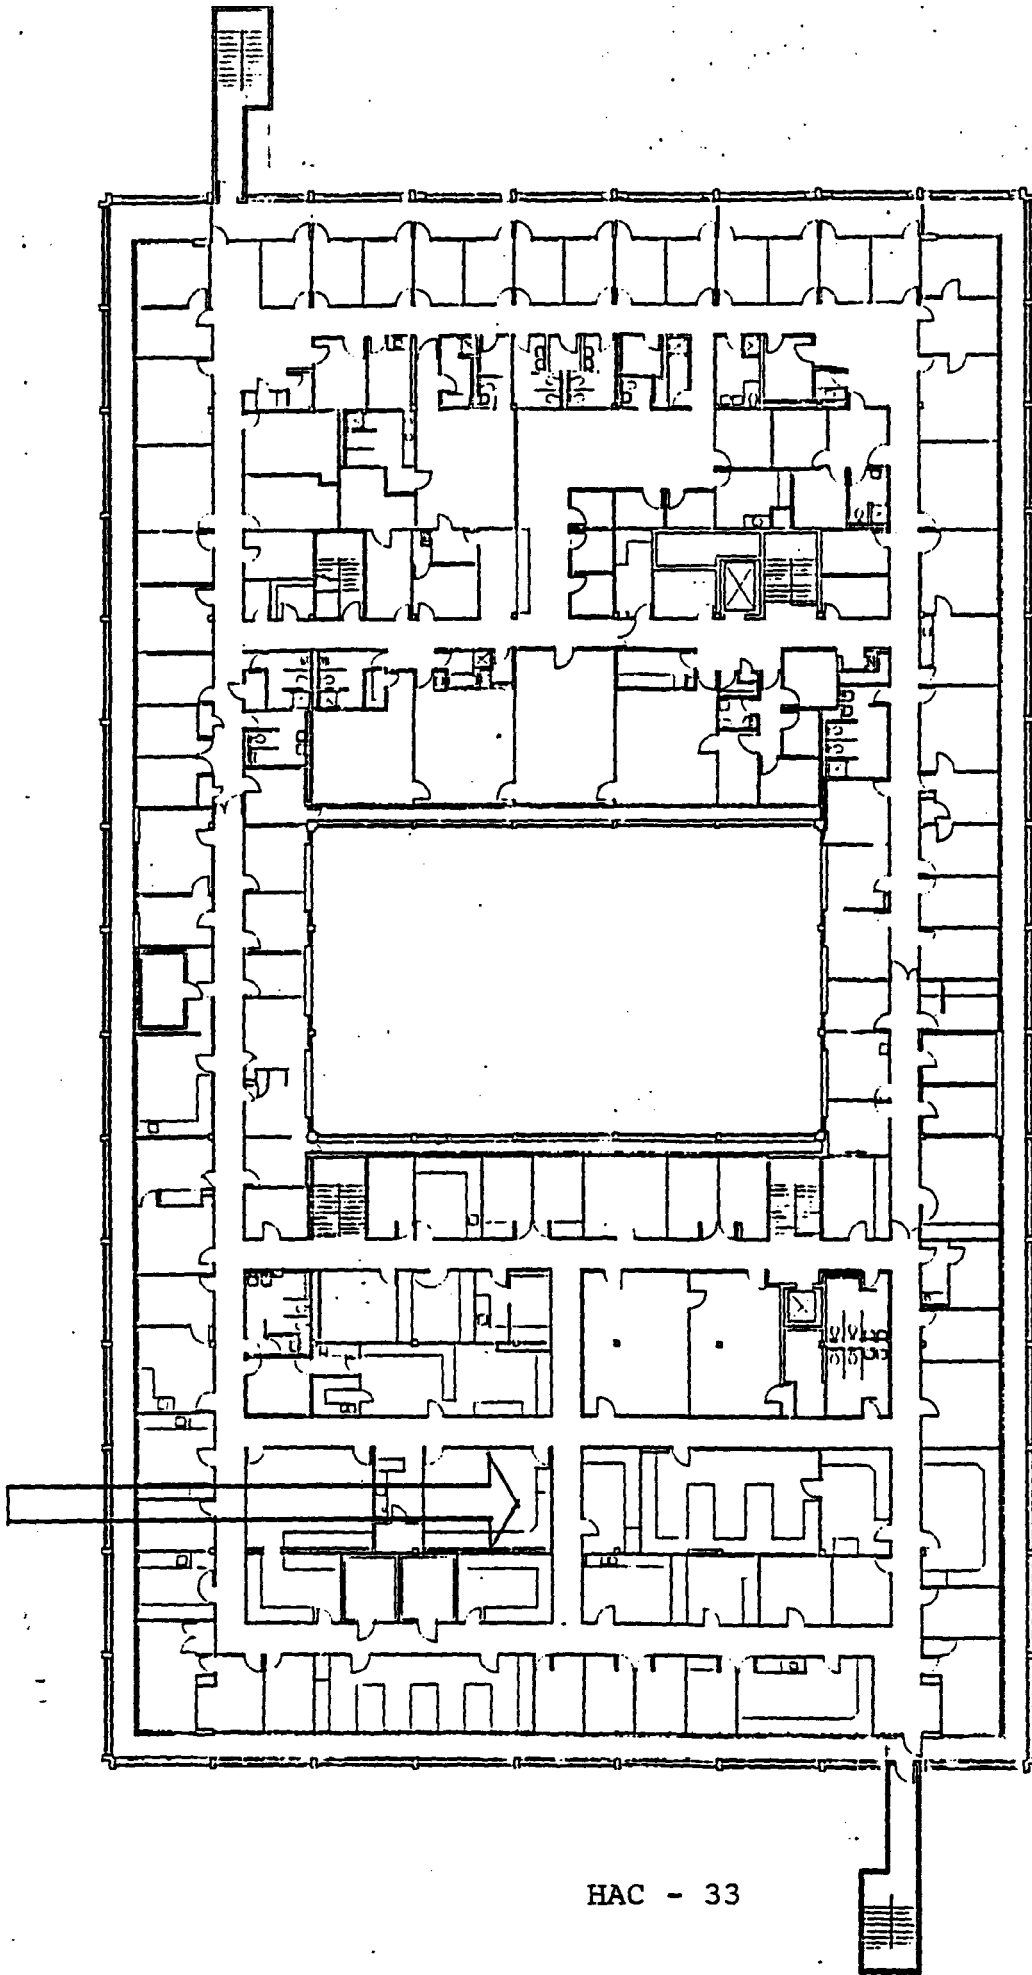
SECOND FLOOR PLAN MSJ-2
